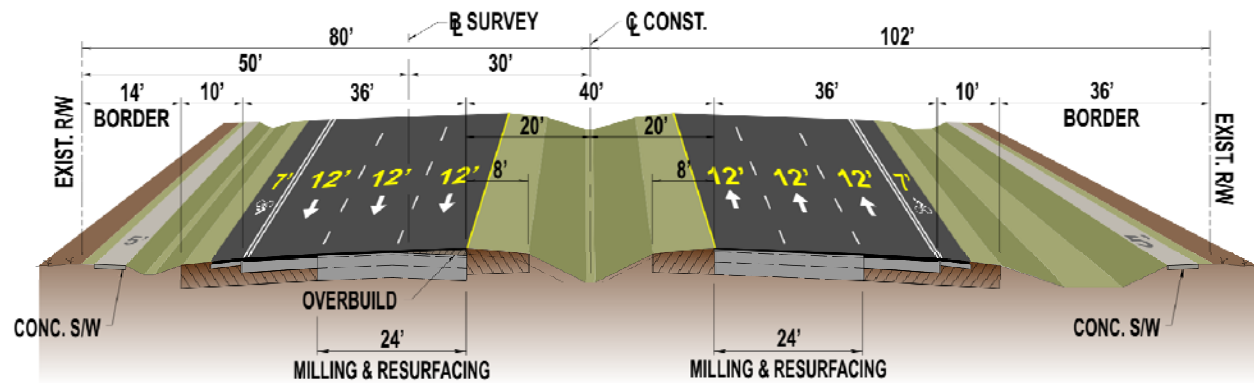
RURAL PAVEMENT SAVING TYPICAL SECTION (SEGMENT 3)
